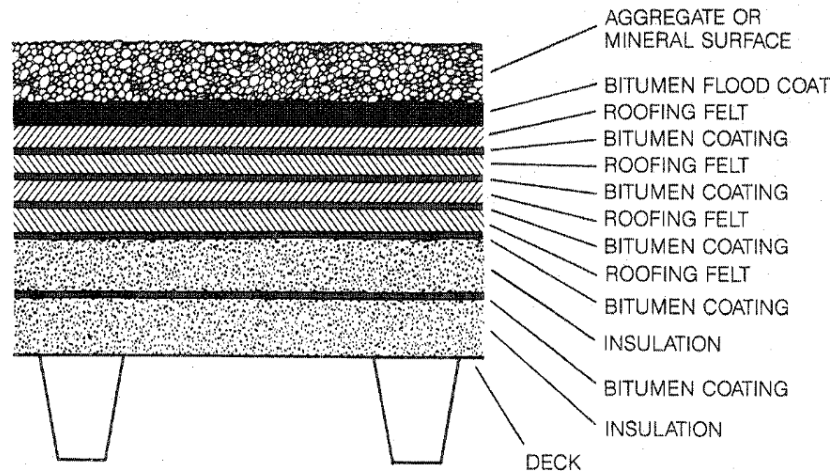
Built-up Roof (BUR) Composition. Source: Roofing Series- Built-Up Systems (1984).
